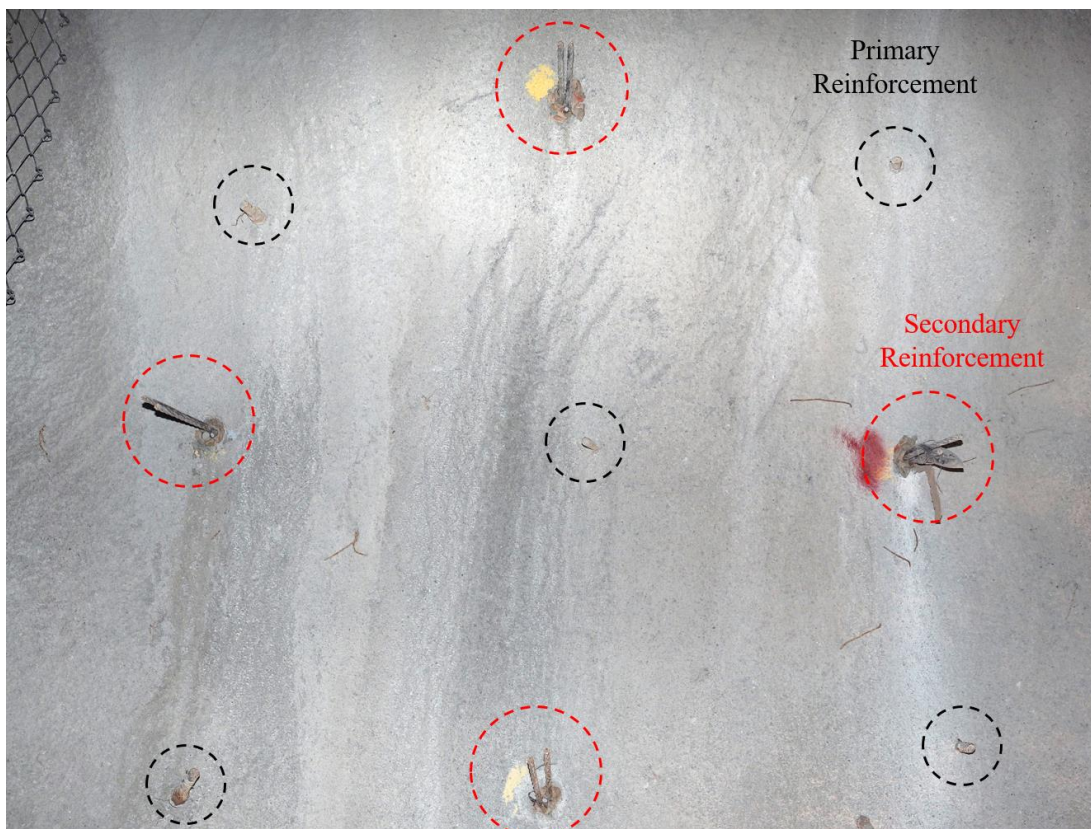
Installation of secondary reinforcement within the primary reinforcement pattern spacing.
